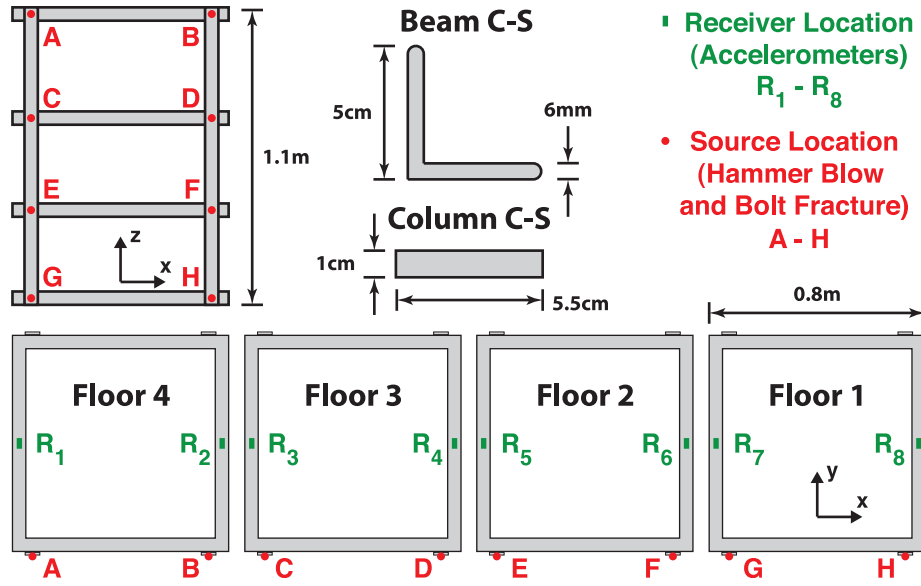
Experimental Setup: Steel frame dimensions, receiver (accelerometer) locations, and source (hammer blow and bolt fracture) locations
